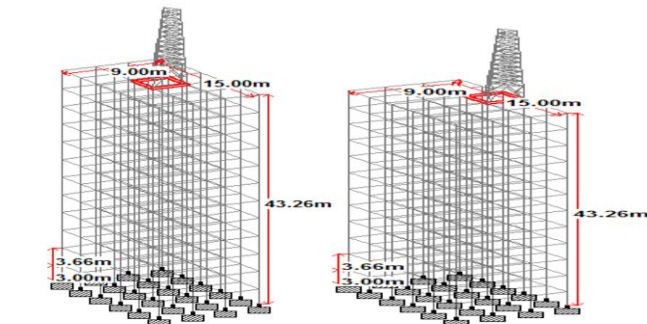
3D Elevation Model-7 Figure: 8 3D Elevation Model-8
